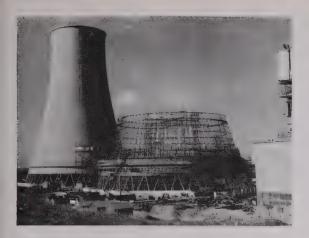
Cooling Towers, Calder Hall 'A' Nuclear Power Station.
